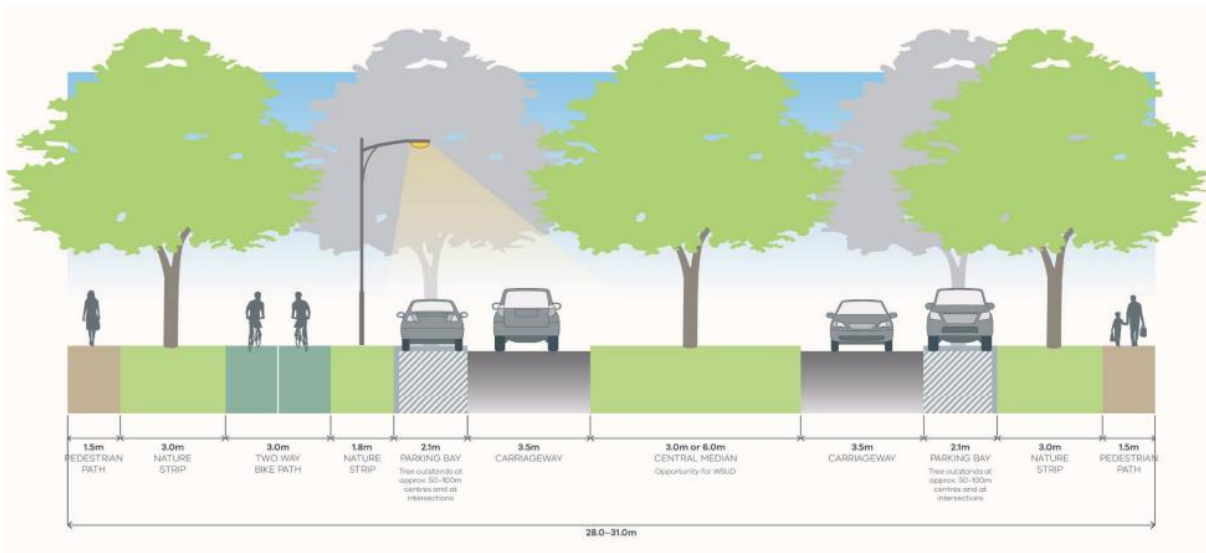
Connector Street Boulevard excerpt from PSP 1068 – Craigieburn West Precinct Structure Plan, Draft for Public Consultation, November 2020
